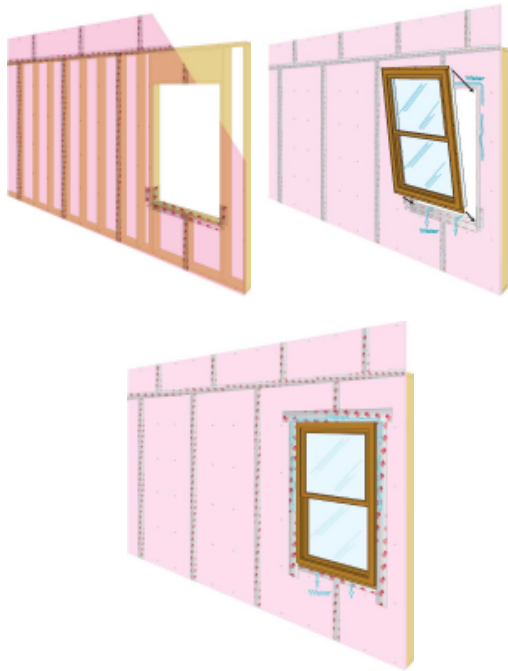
TYPICAL WINDOW FLASHING DETAIL
